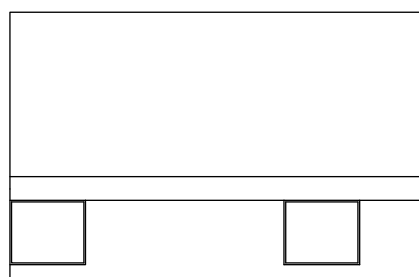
1:200 Windows lifted from the floor creating seating area in the window frame
